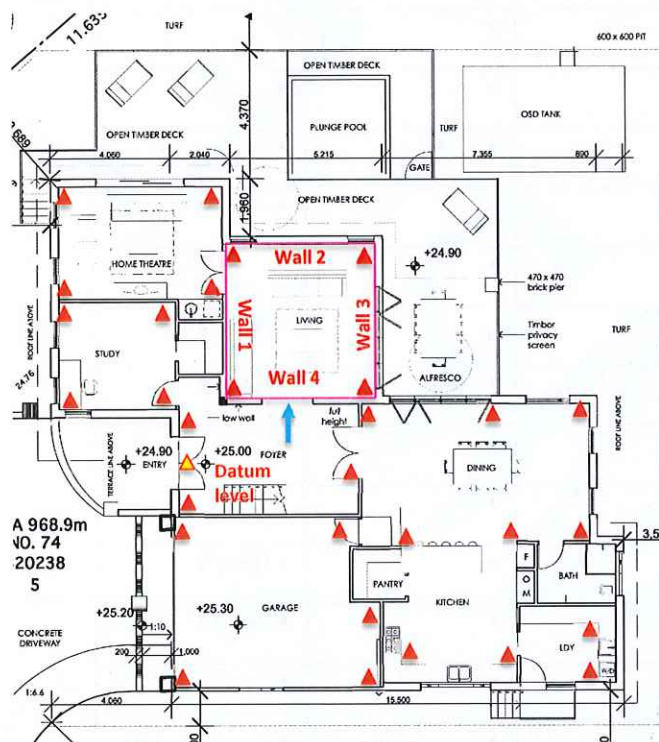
Indicative layout plan of a residential dwelling showing location where datum finished floor level is typically measured (yellow-filled red triangle) and other locations throughout the dwelling where finished floor level could be measured (red triangles). The order in which the walls are inspected around a room is shown indicatively in the living room (bounded by a magenta rectangle) based on the assumption that the room is entered in the direction shown by the blue arrow.
